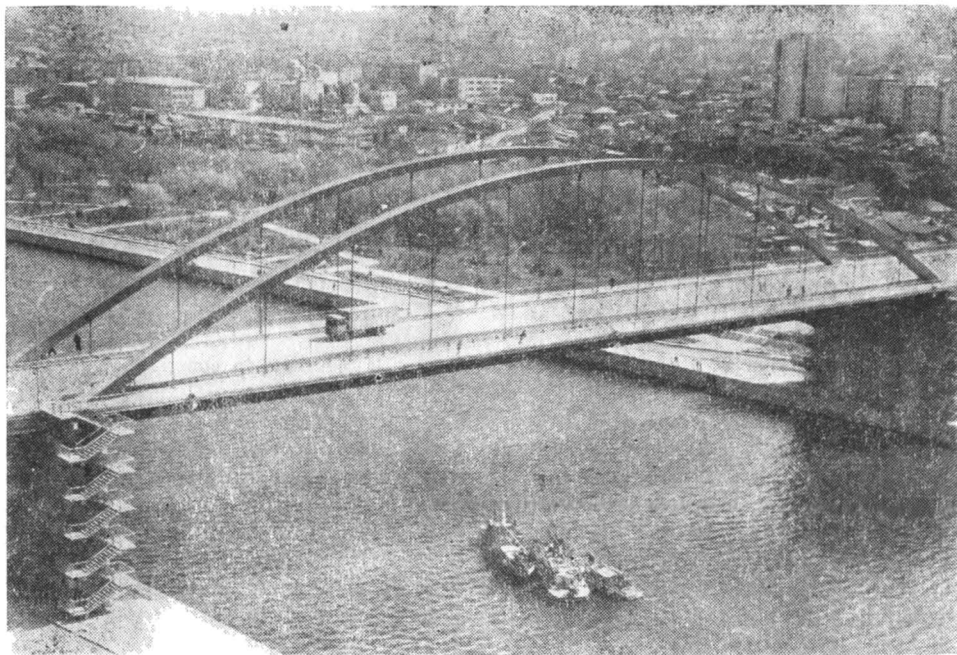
The roadway bridge over the canal in the area of the Medgidia town (photo Agerpres).
